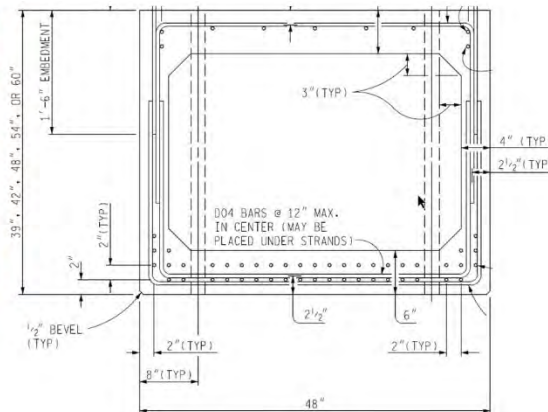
Example Idealized Bridge Girders (figures on right from MDOT BDG).
